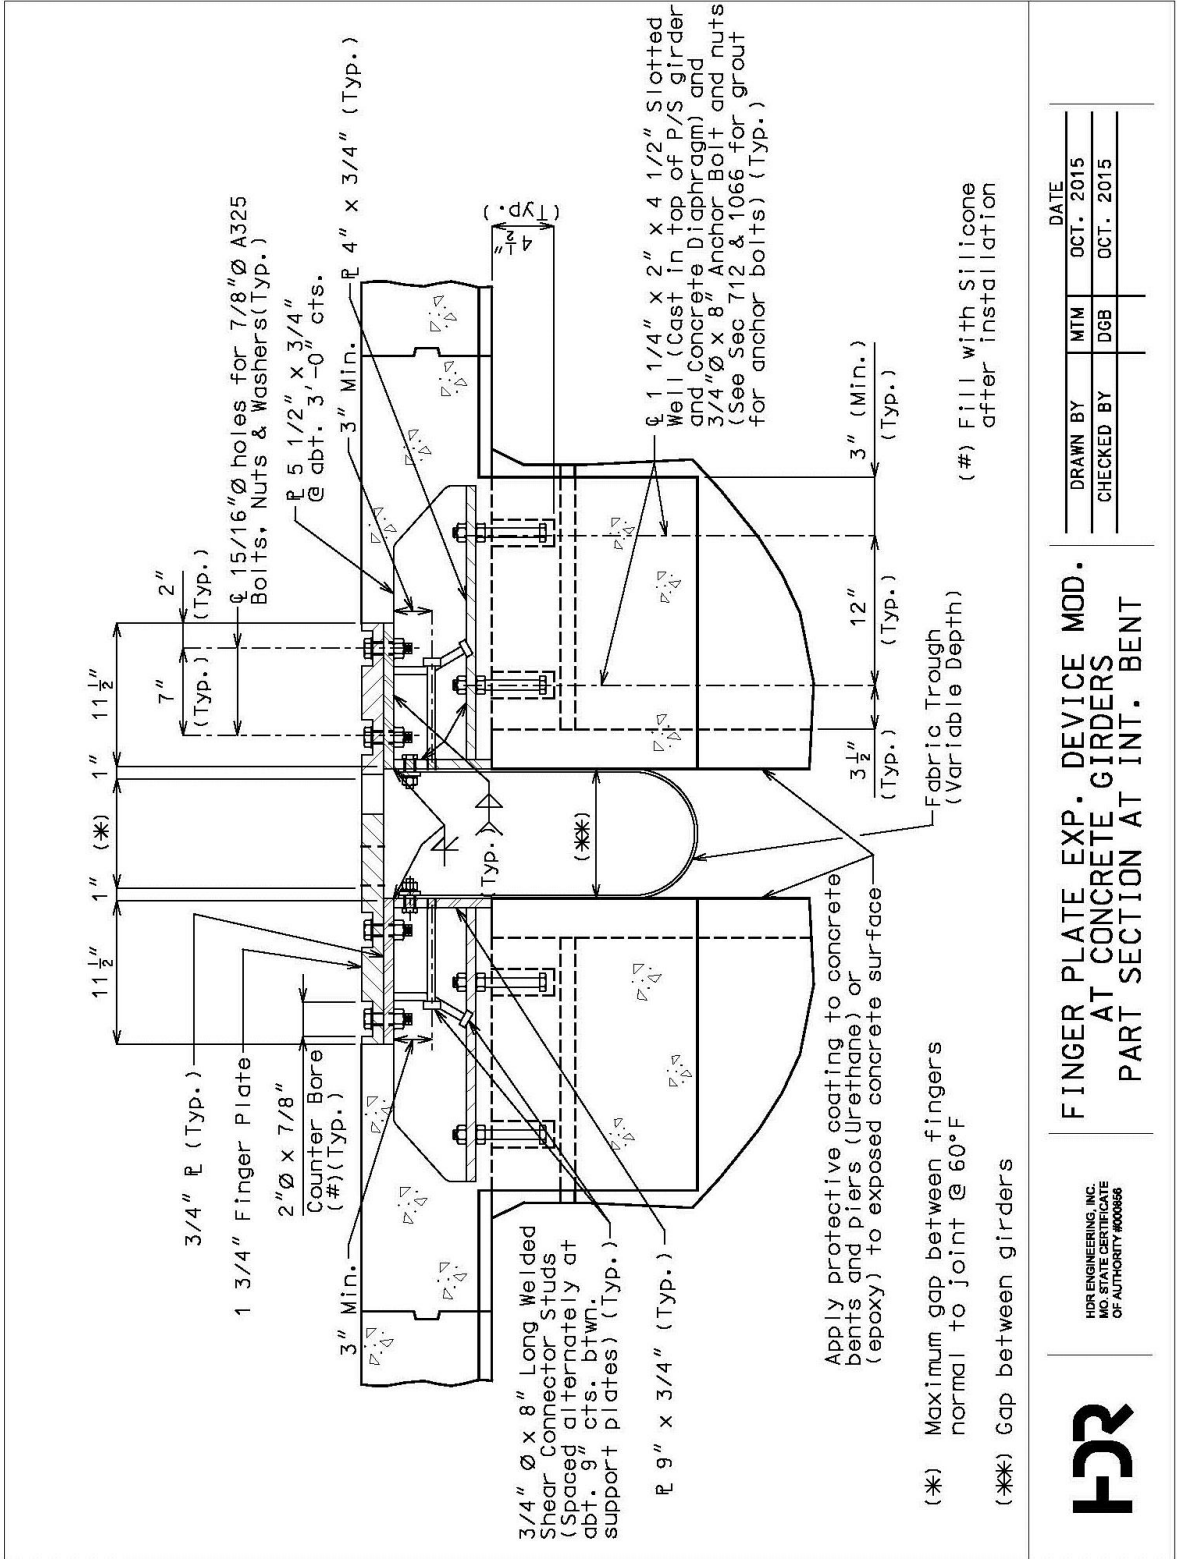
Plan of modified finger plate expansion device for concrete girders
